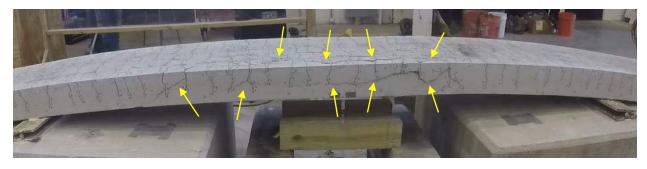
S-40-5 Face- and Side-Splitting Failure
